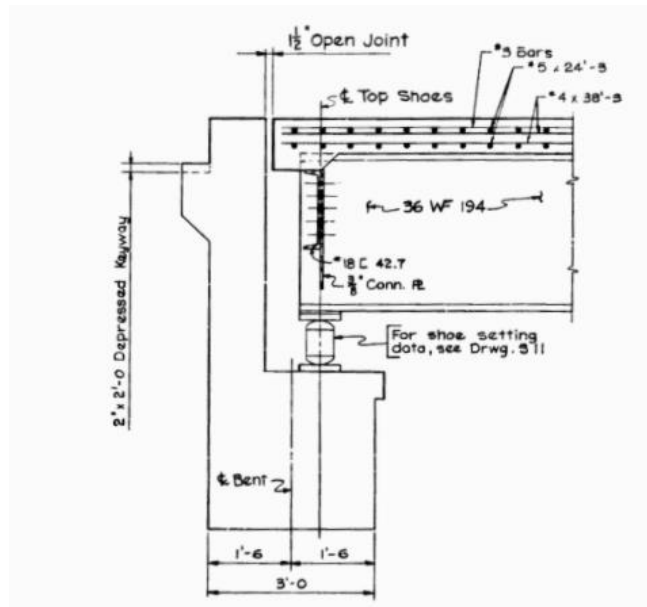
Abutment Detail of the Bridge (NBI 24210) (1971)
